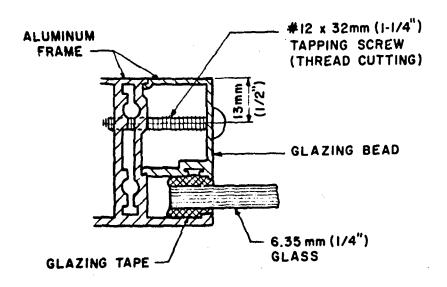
Cross-section of aluminum glazing bead strengthened with screws
